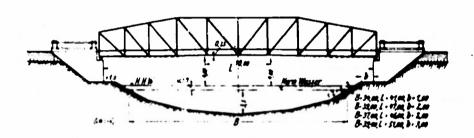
Standard Cross Sections of the Mittelland Canal in Cuts. on Embankments, and Under Bridges
